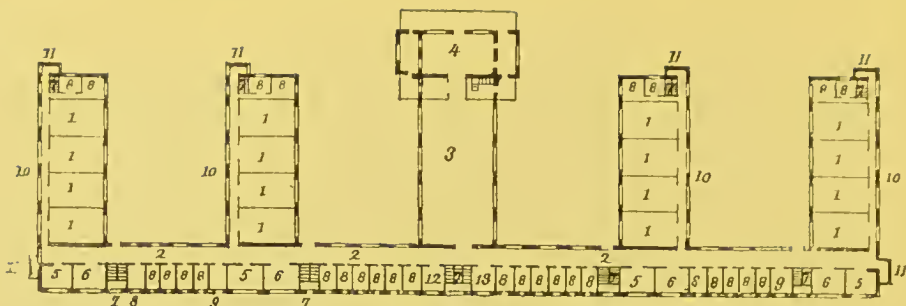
PROPOSED PLANS FOR FRENCH INFANTRY BARRACKS :
